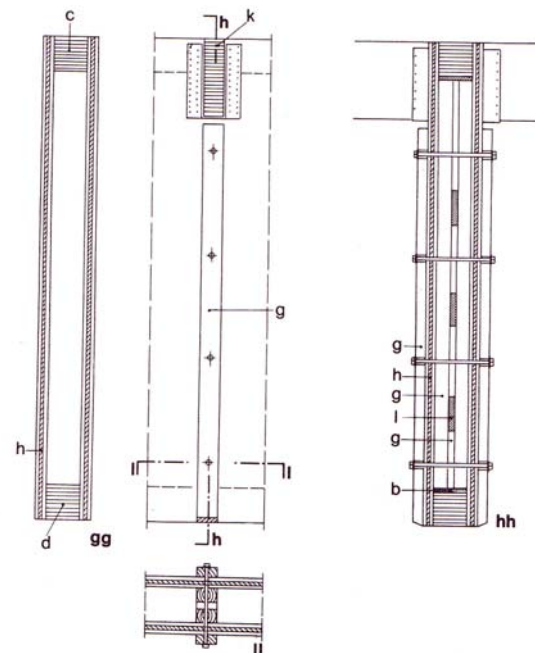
Cross-section of the box-girders in the ice-arena (from [1]); c-upper girder, d-lower-girder, h - Kämpf web-board, k-purlin, g-reinforcement (to avoid buckling)
